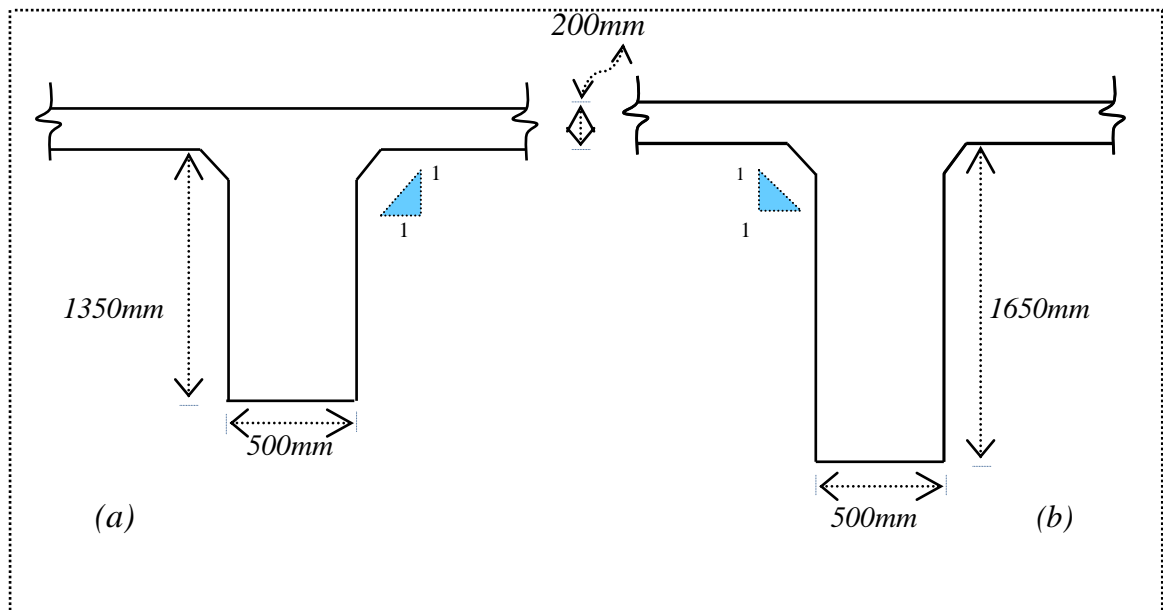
Dimensions of Cast in situ Simply-Supported Concrete Girder for (a) Bridge-1 and (b) Bridge-2
